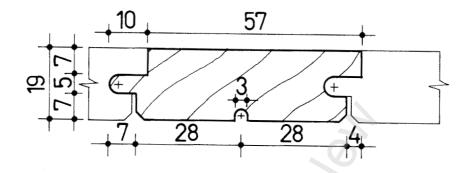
75 mm x 25 mm TONGUE AND GROOVE SECRET NAIL FLOORING (full size)
